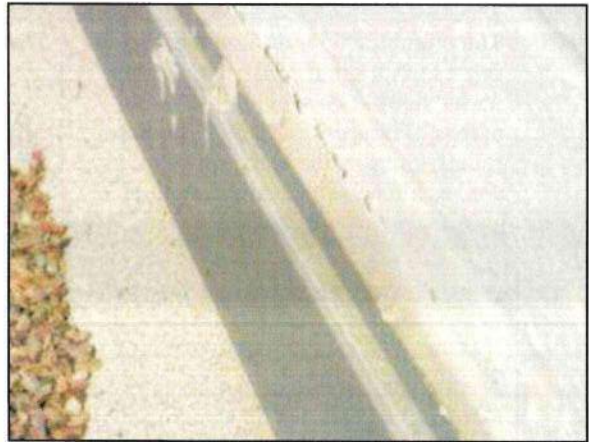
Fire Station #1 Caulk repairs are needed at the termination flashing on the roof.
